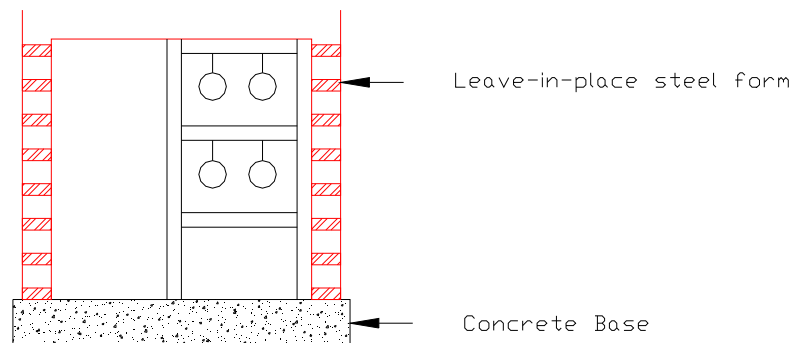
Pipe Tunnel Module (temporary bracing not shown)
